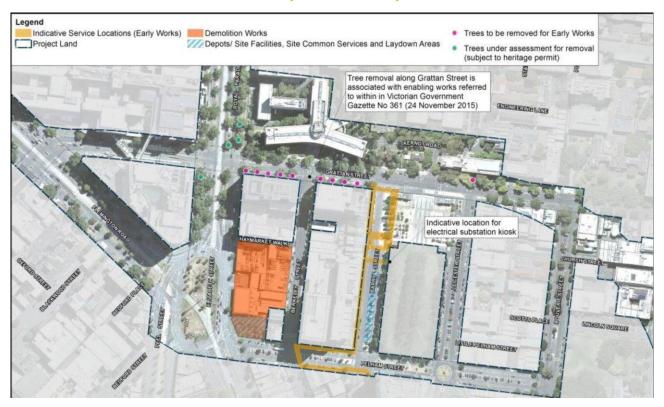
Excerpt from the Site Layout Plan which identifies Early Works within the Parkville Station Precinct (refer to Appendix 1).
